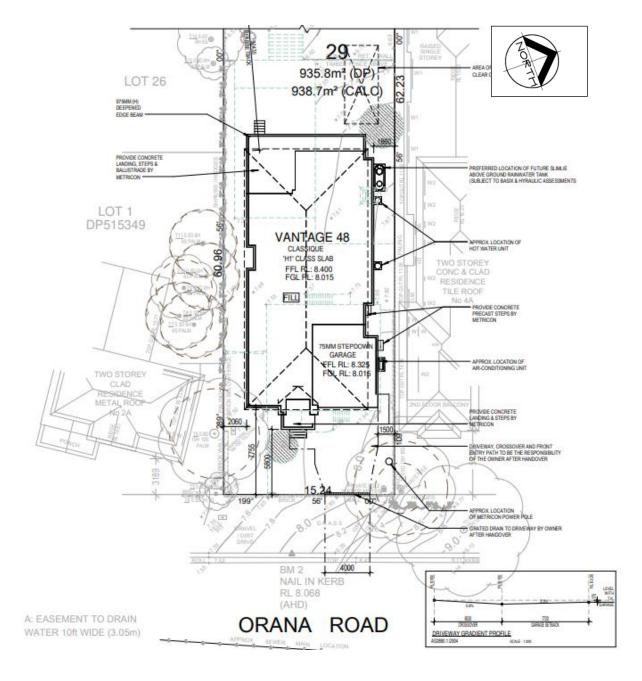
Site Plan of Proposed Development (Metricon Homes)
